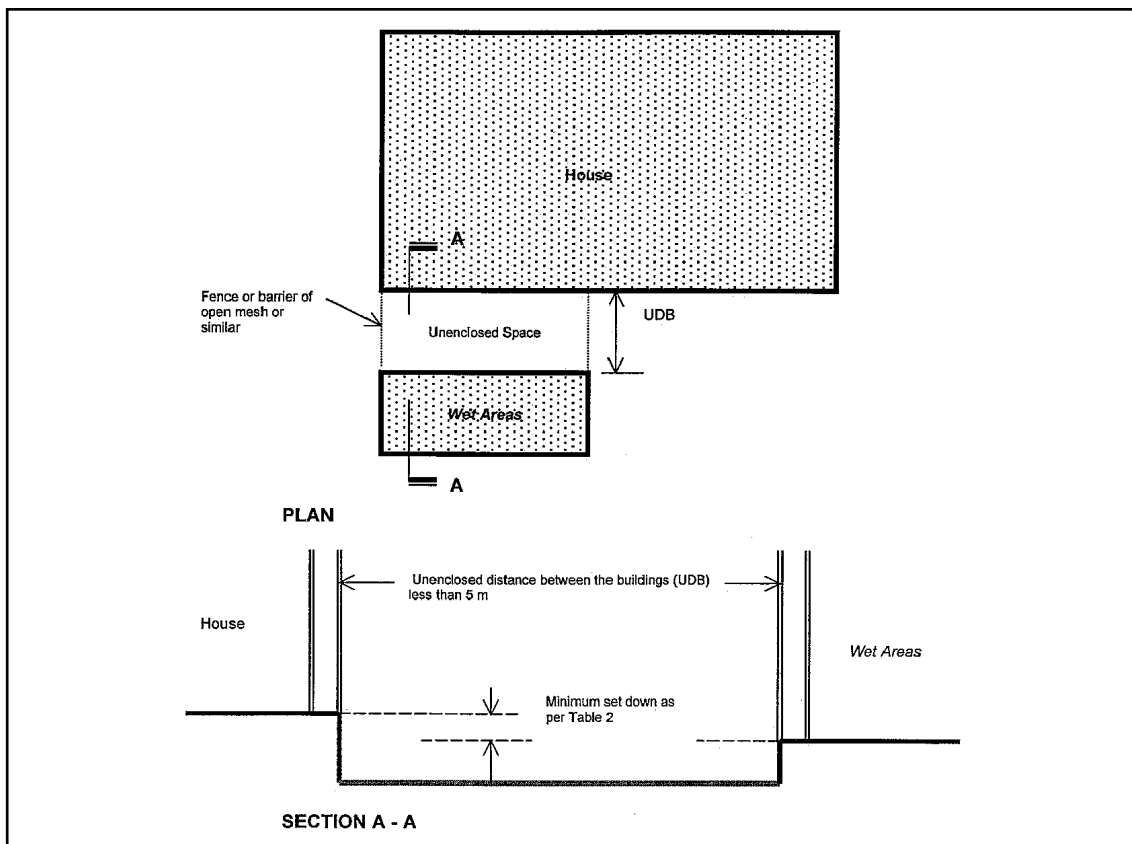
Wet area separated to the house, with the space between the buildings unenclosed.
